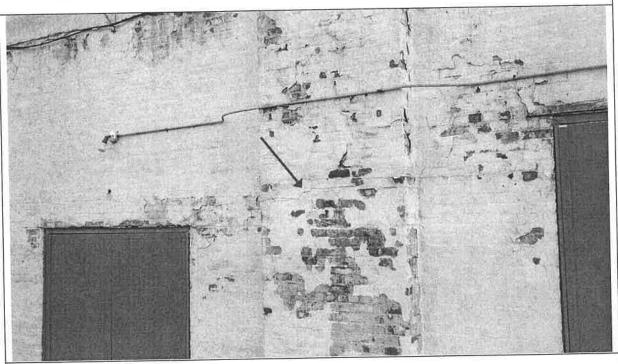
Brick Pier on West Exterior Wall: Note horizontal crack.
